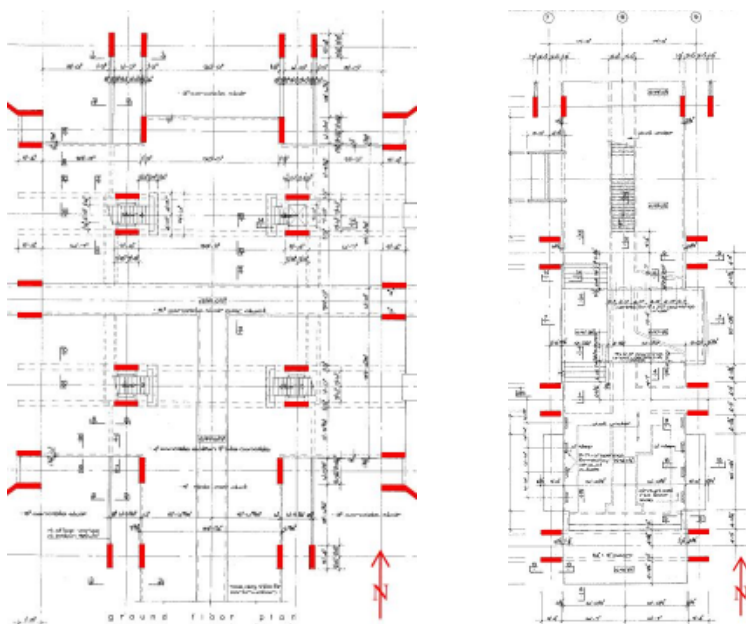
Lobby (left) and Restaurant (right) Lateral Force-Resisting Systems
